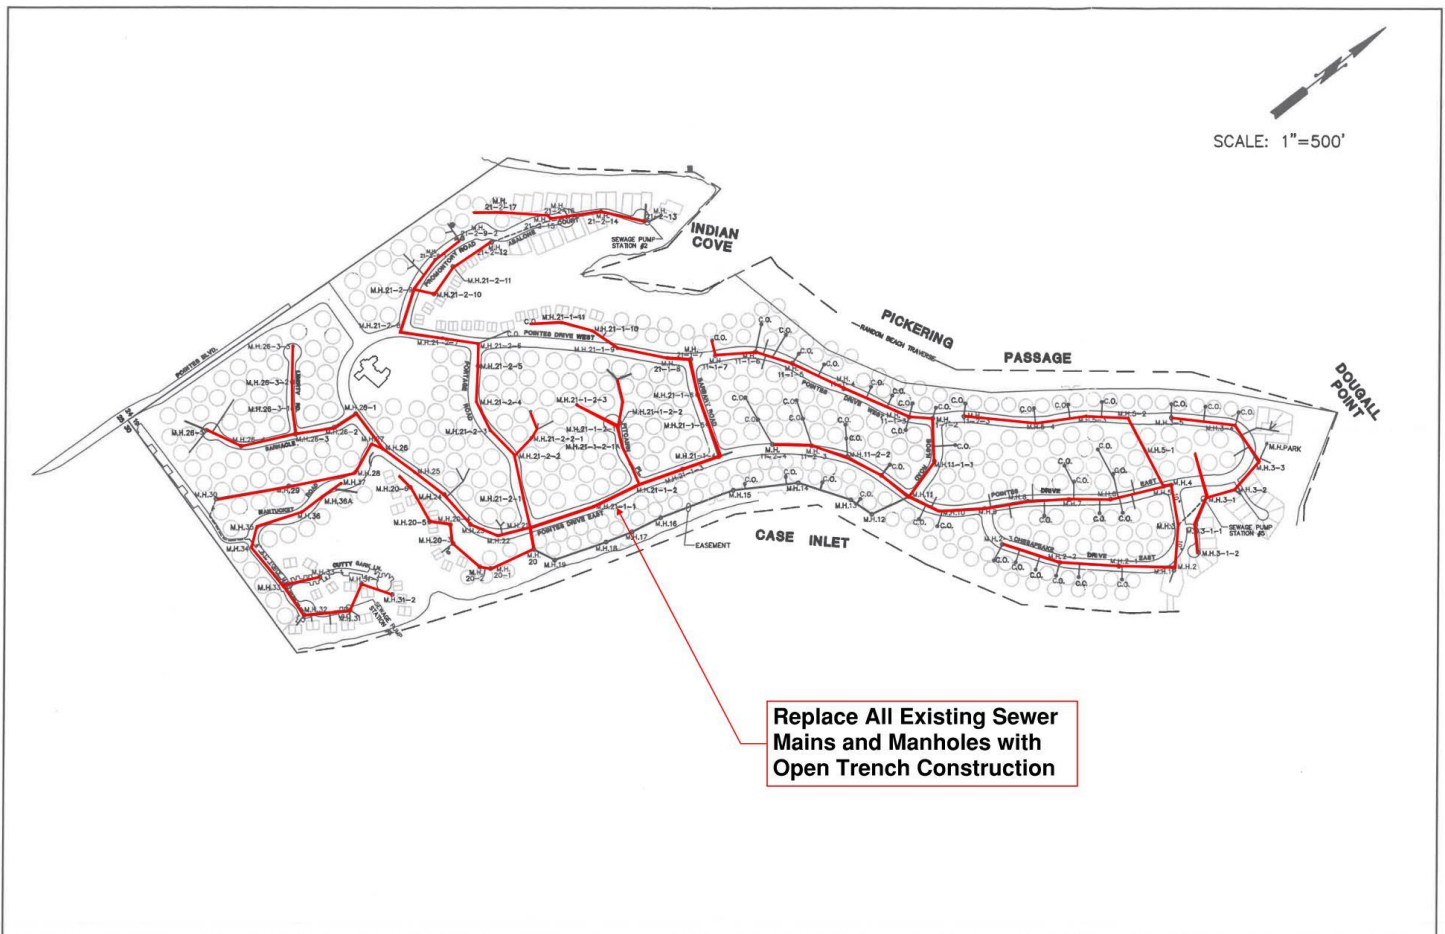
Alternative 2 Open Trench Gravity Sewer Replacement
